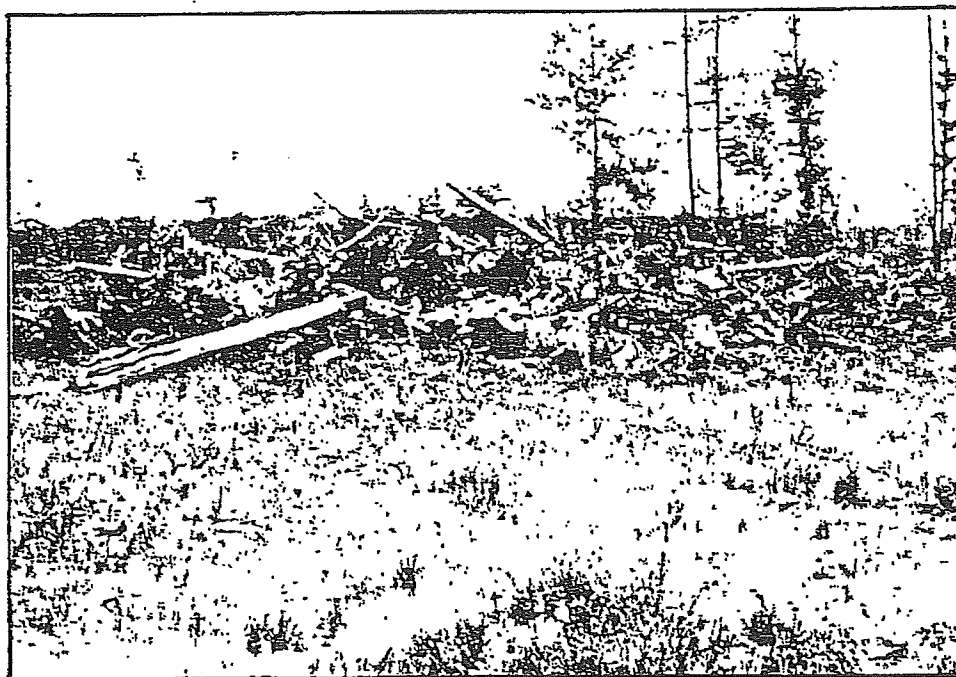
Typical Slash/Stump Pile on Proposed Landfill Site.
